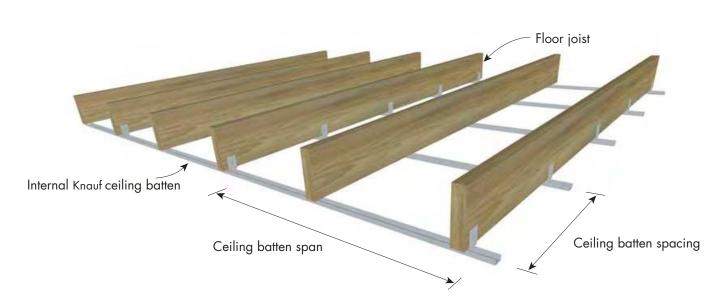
Internal Knauf Ceiling Batten Span and Spacing
